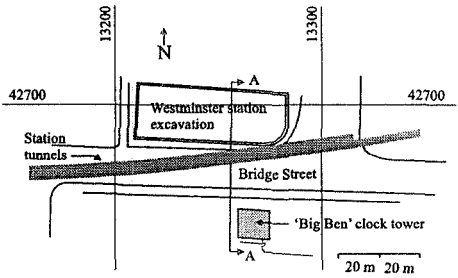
Plan of the site for the Jubilee Line station at Westminster
